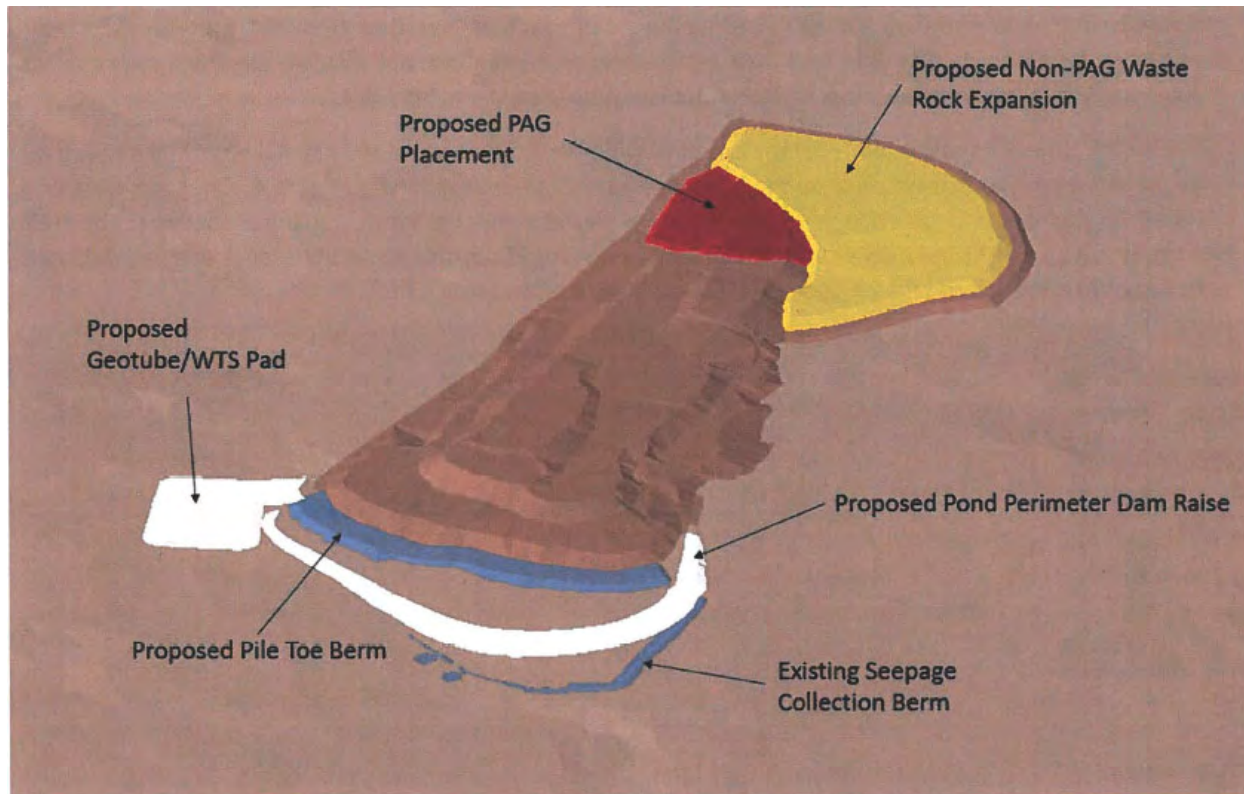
Waste Rock Deposition Plan – Summer 2018 – Plan View
